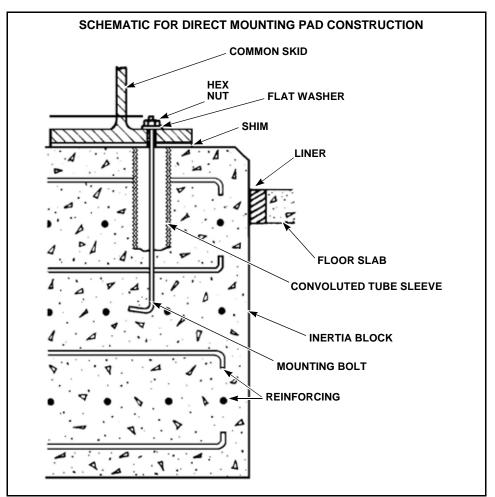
Common Skid Mounted Directly to Inertia Block or Pad
